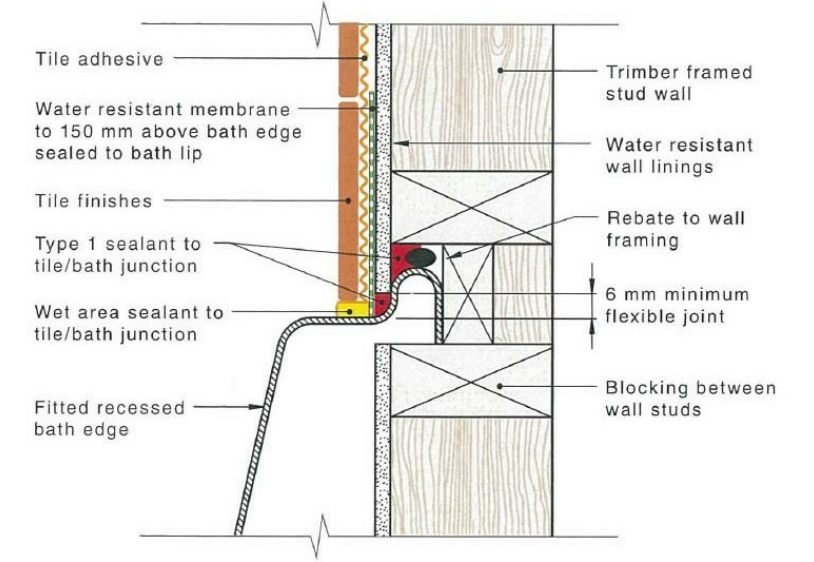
(D) — Bath with no shower over it — Fitted bath — Timber-framed wall
